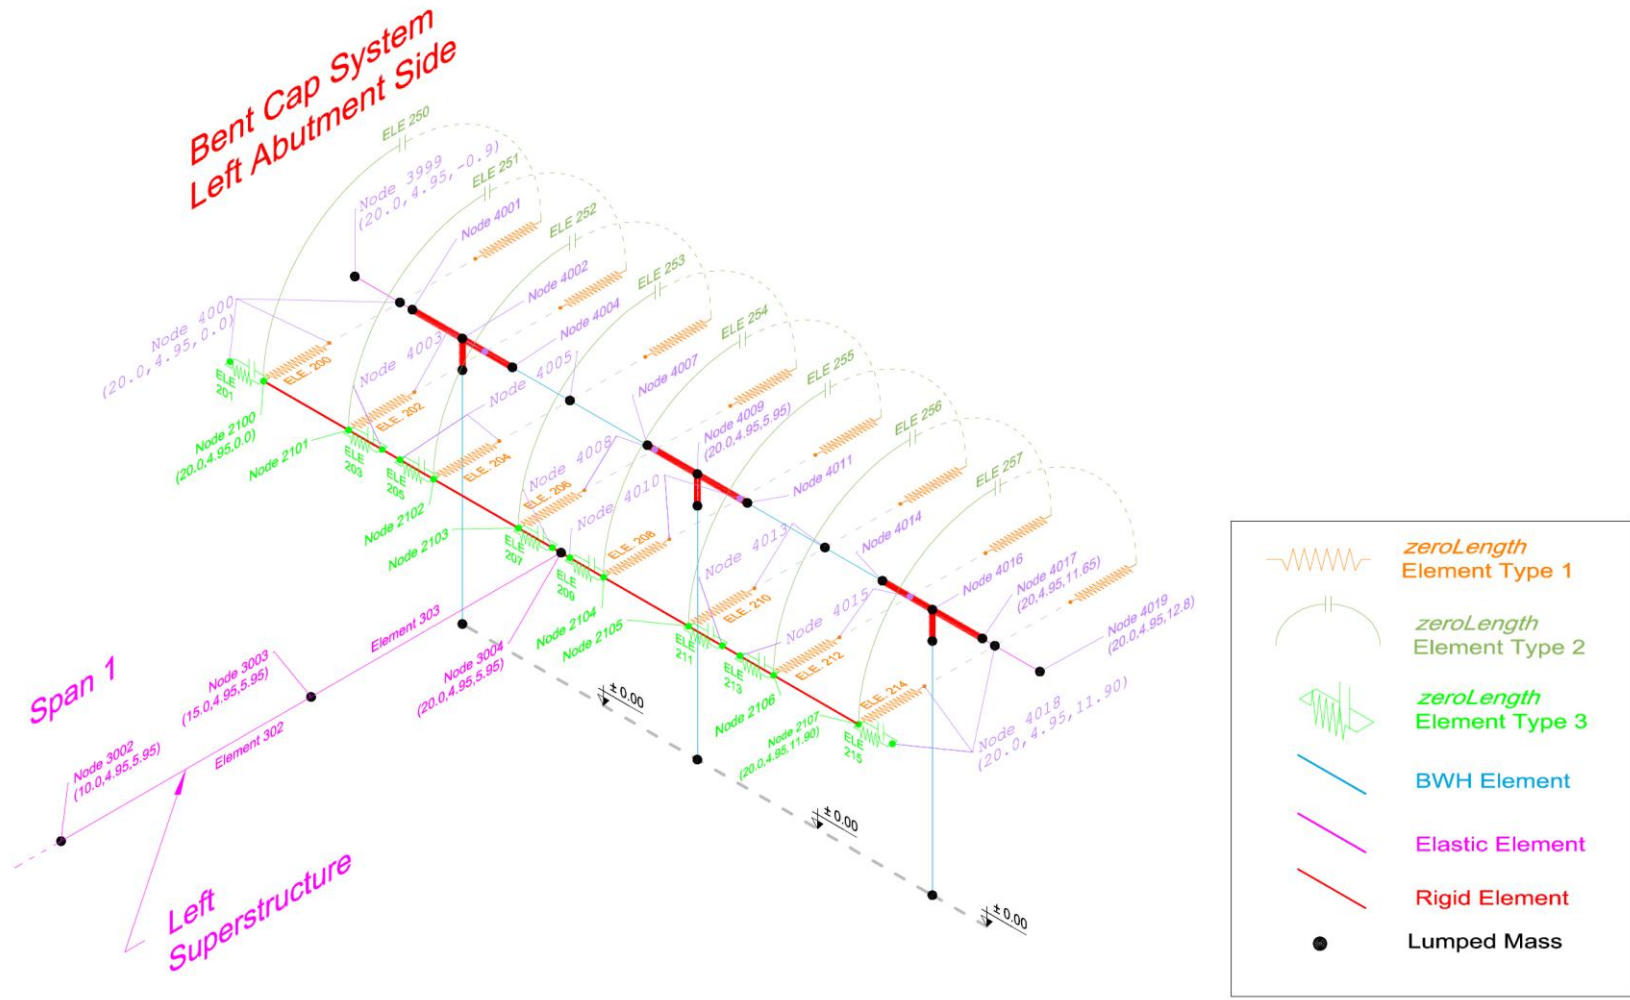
Elek Deresi Bridge analytical model – bent cap system – left abutment side.
